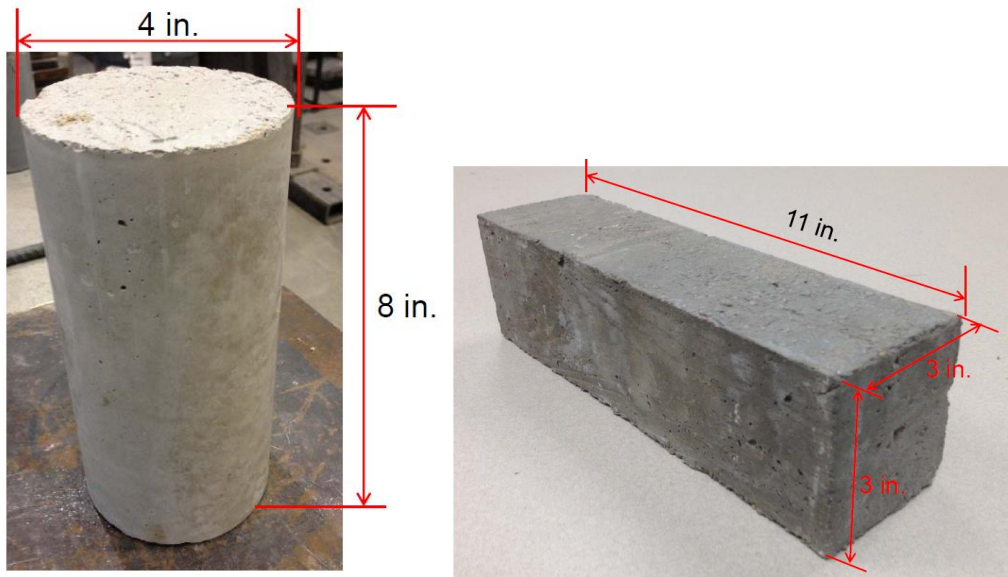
Typical concrete cylinder and beams used for the preliminary experiments
